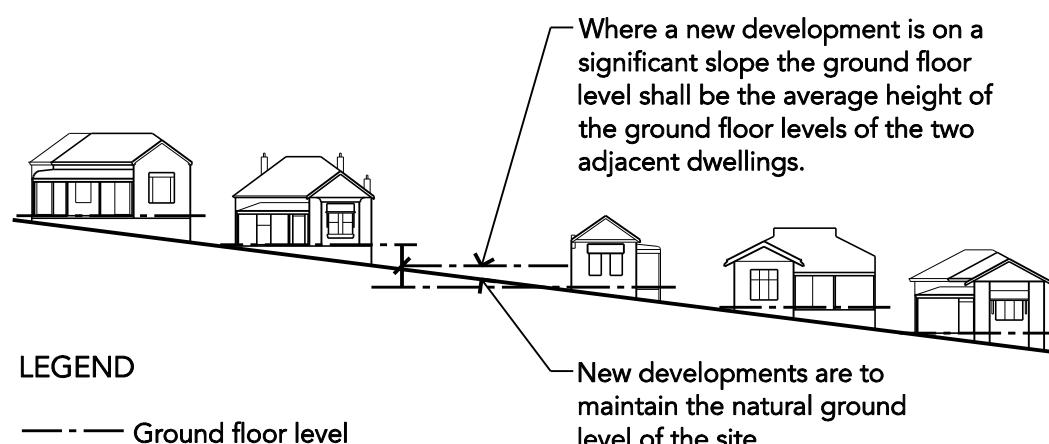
Street elevation illustrating ground floor level for new developments – Griffiths Architects 2012.
